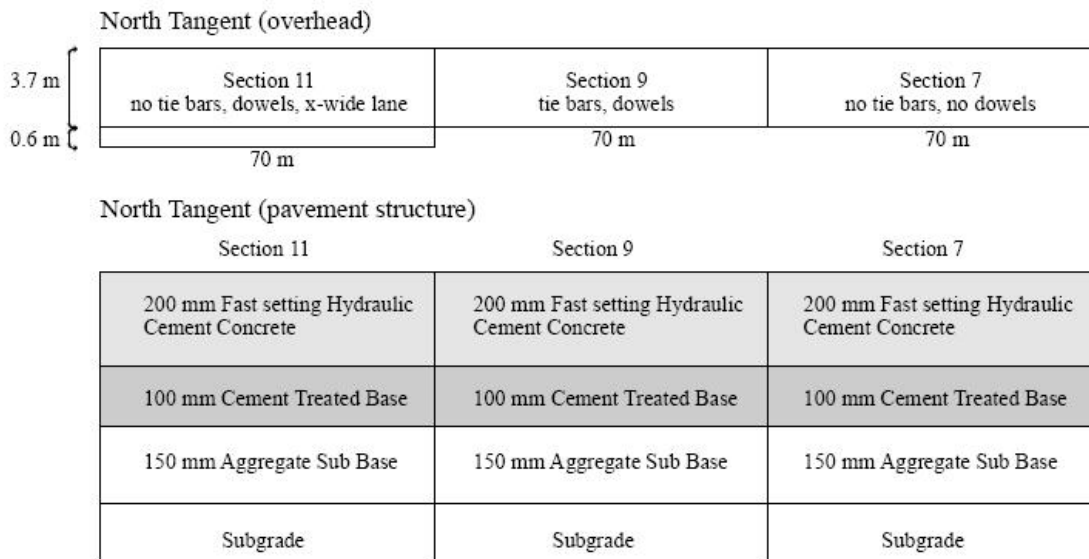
North Tangent layout and pavement structure diagram (from Roesler et al., 2000).
